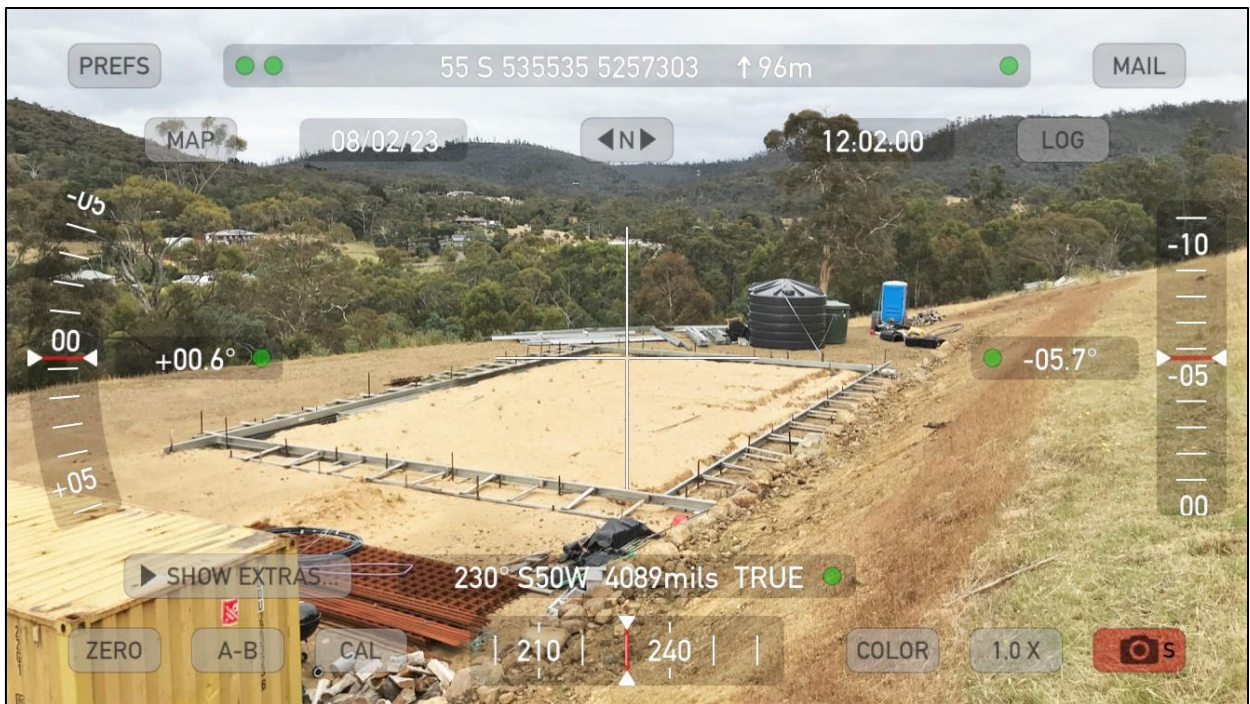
Cut-and-fill at the western end of the development site, with proposed shed site at centre
